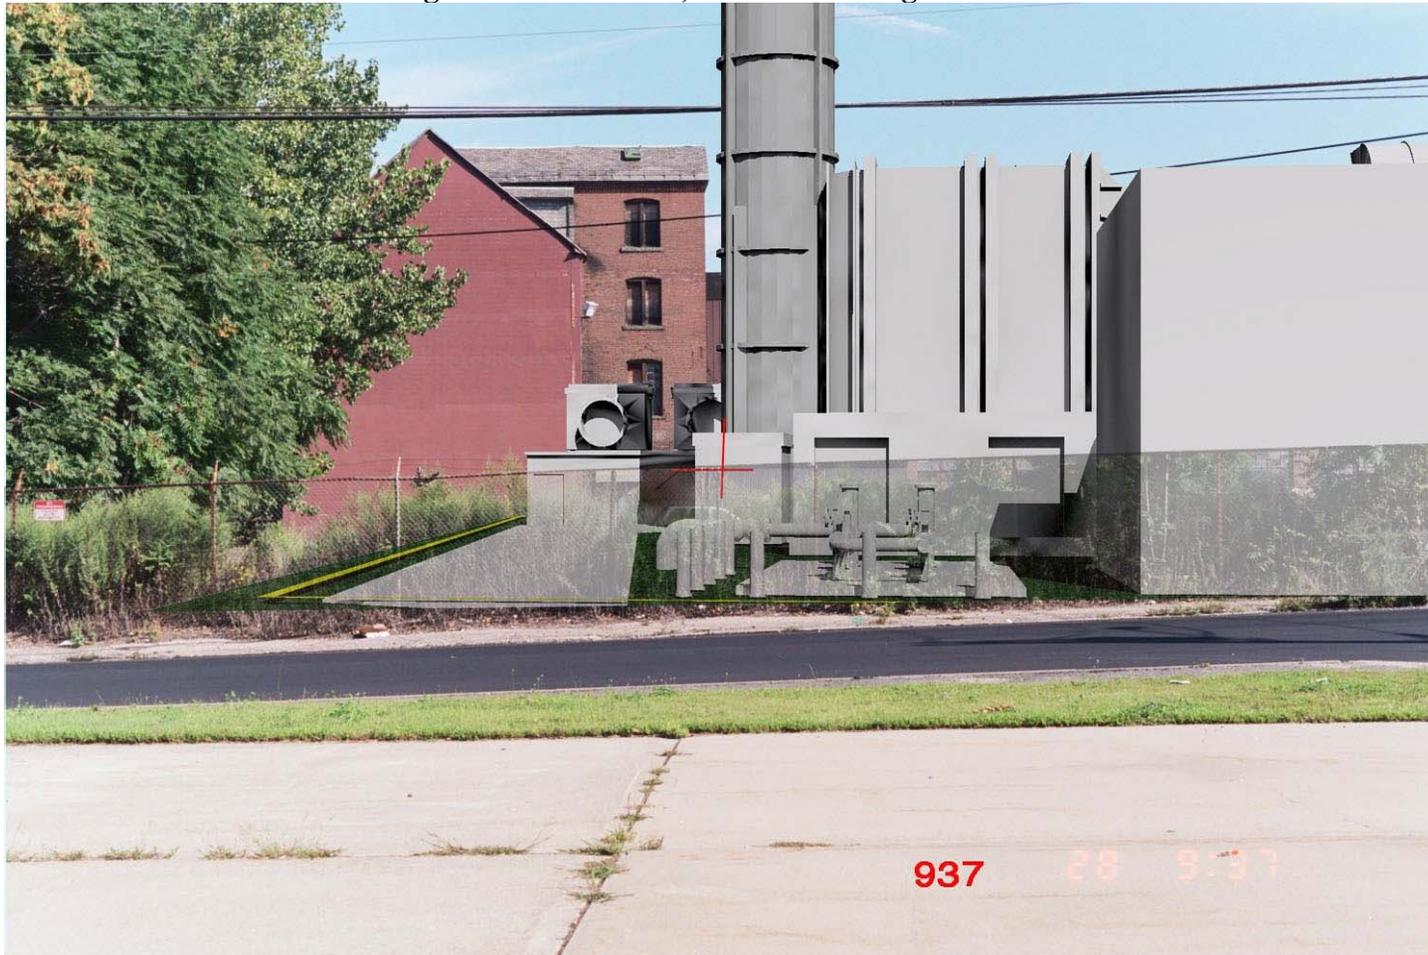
Photo 9:46, from 20 Railroad Hill Street
